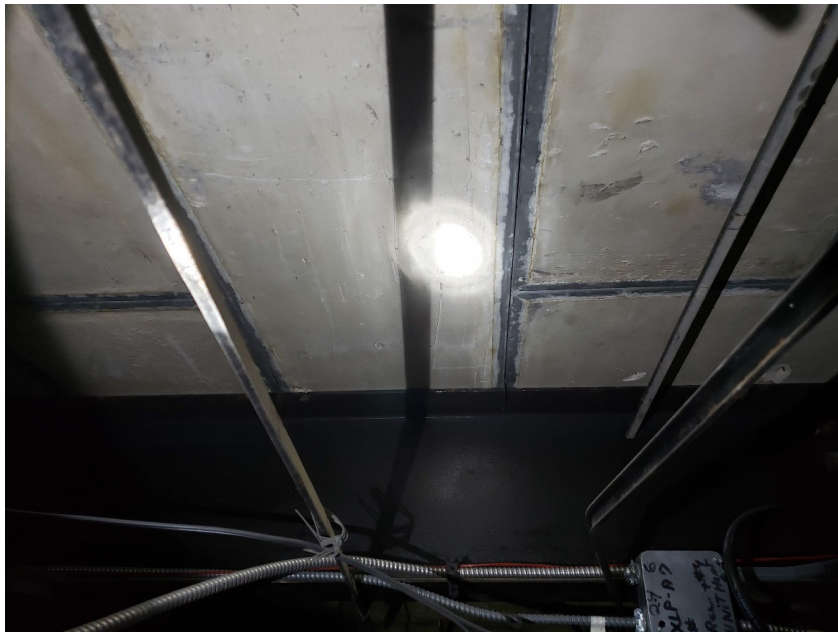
Room 3 Ceiling w/ Minor Spalling
